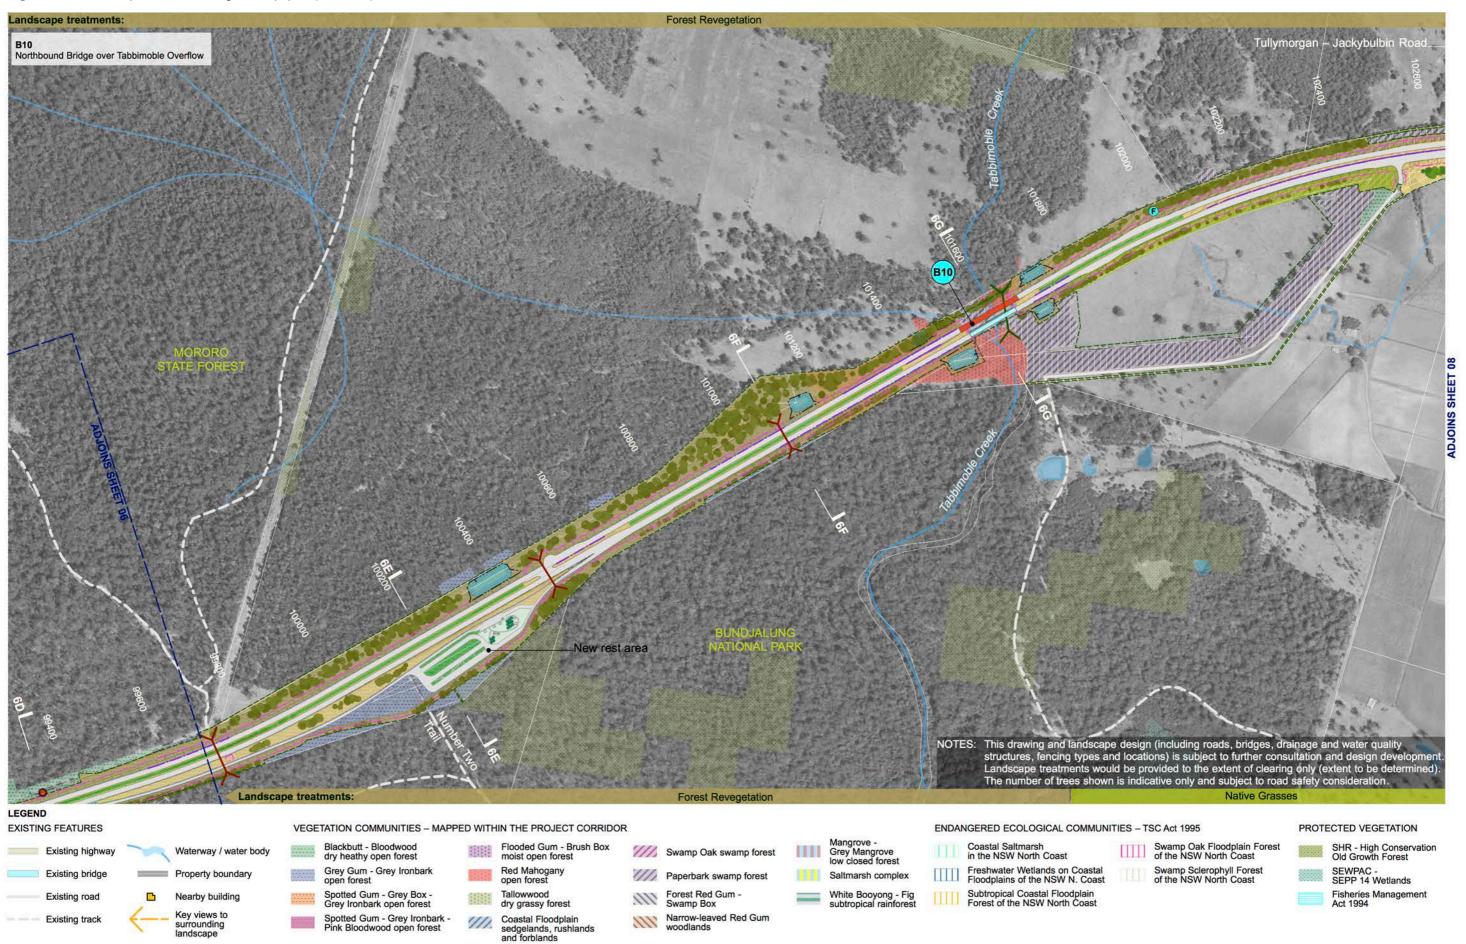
Landscape and urban design concept plan (10 sheets)
